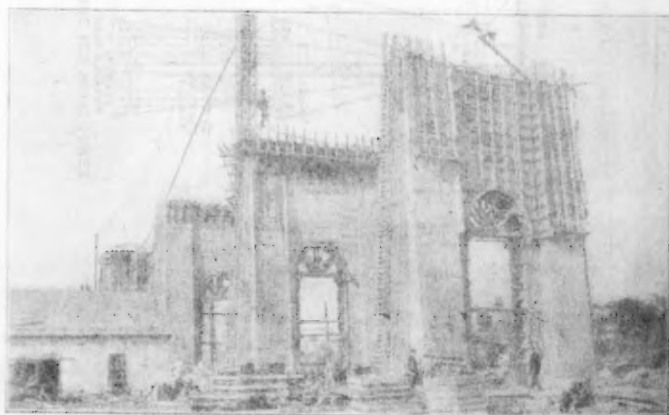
CONSTRUCTION OF CONCRETE PIERS ON LONG ISLAND.
